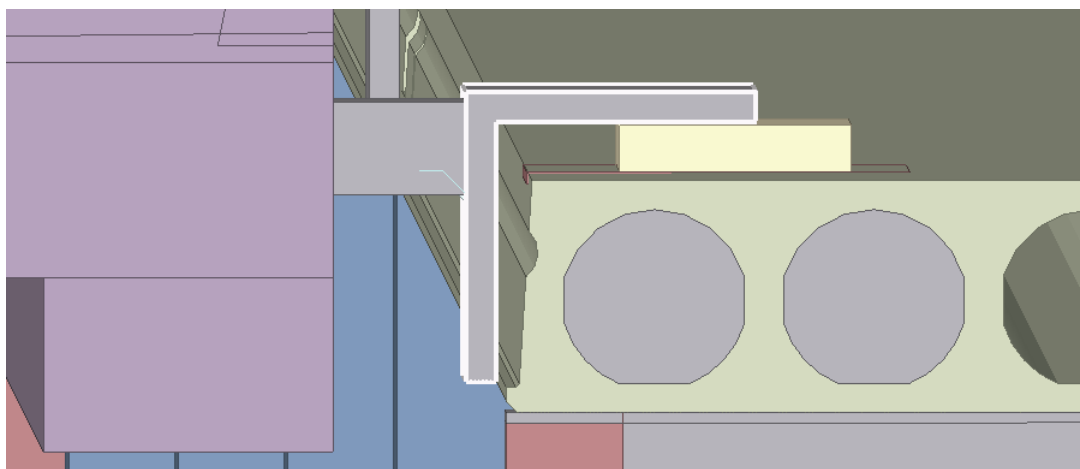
Example of how the outer voids are filled with cast concrete to connect the balcony.
